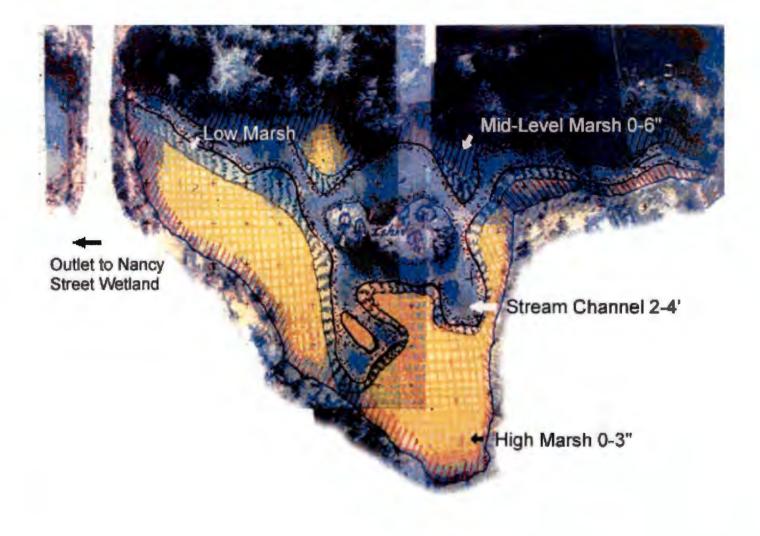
Church of the Nazarene Plan Plan by K Koski.
